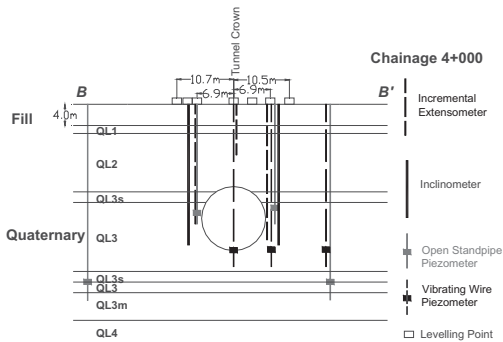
Instrumented reference section at chainage 4 + 000 m.
